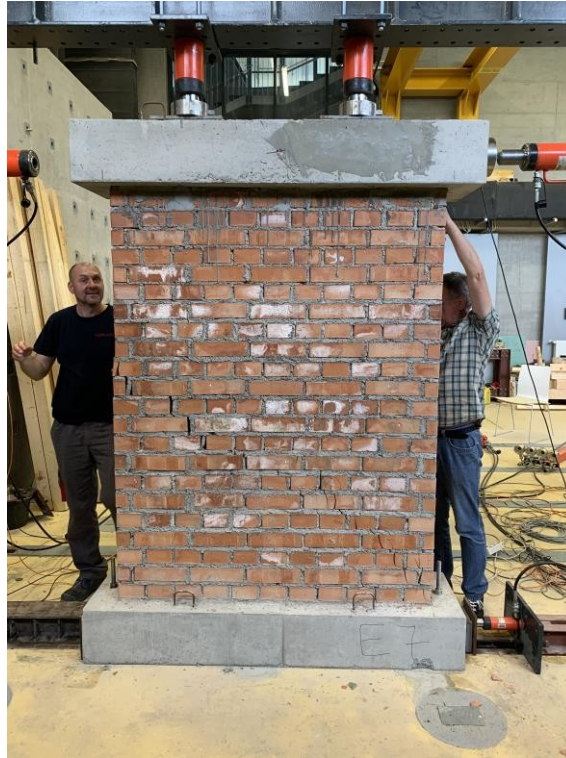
Final failure mechanism of URM 3 pier
